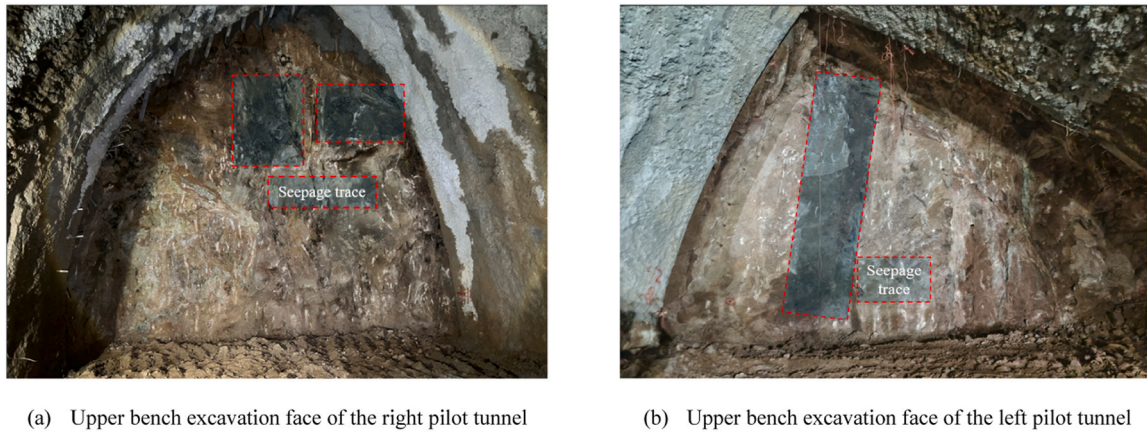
The schematic diagram of seepage trace on tunnel face.
